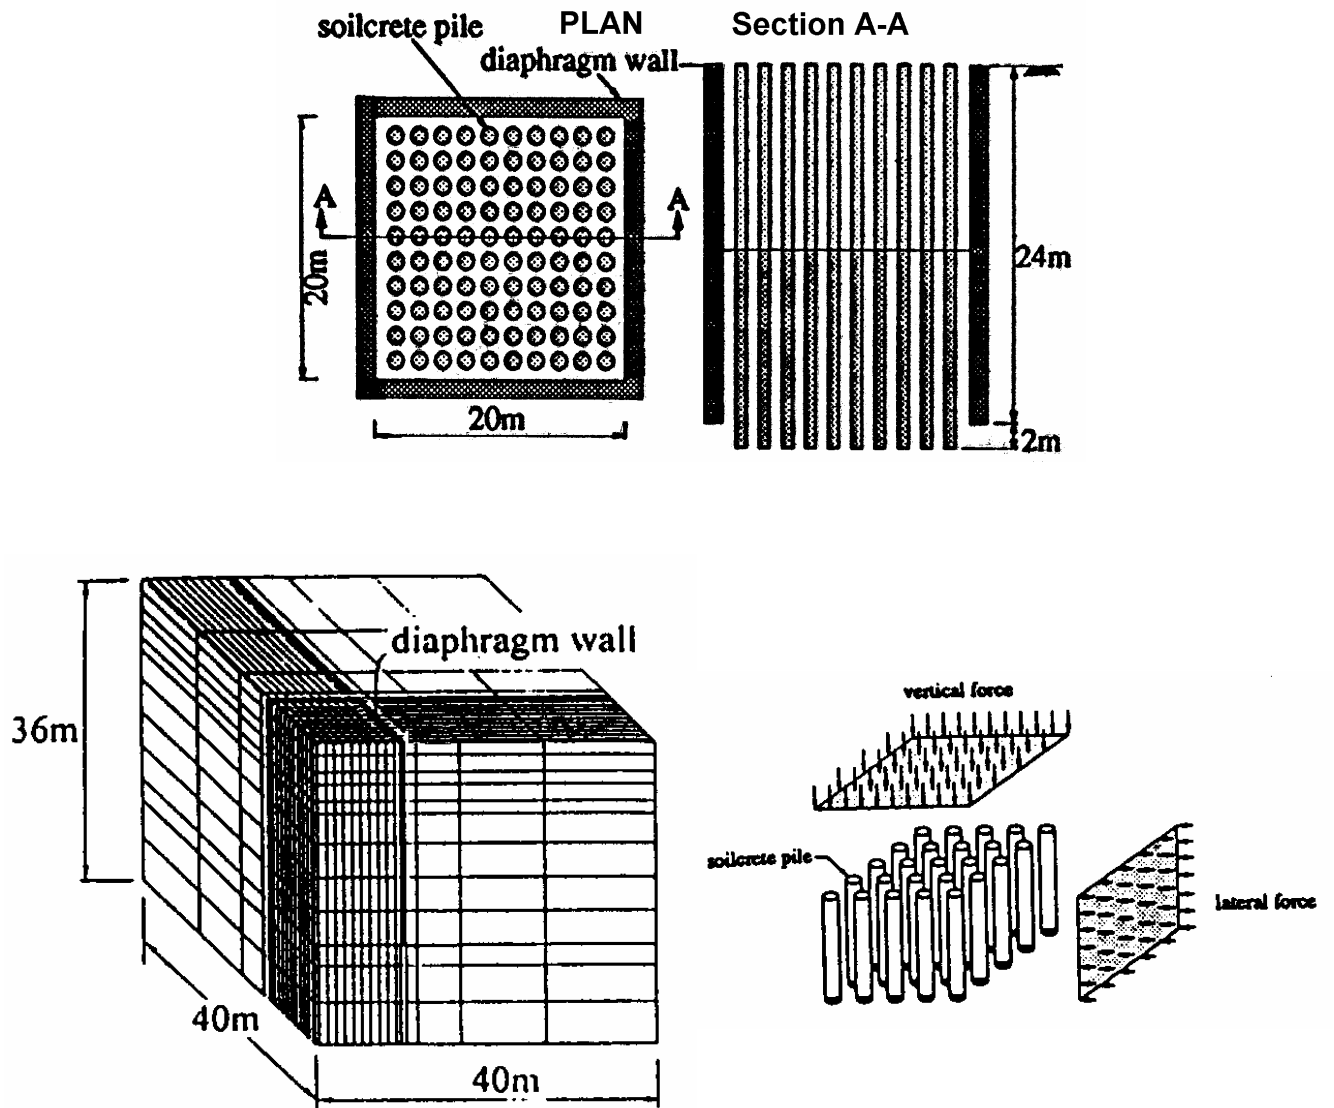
Column type of ground improvement in hypothetical excavation [after Ou and Wu (1996)]
